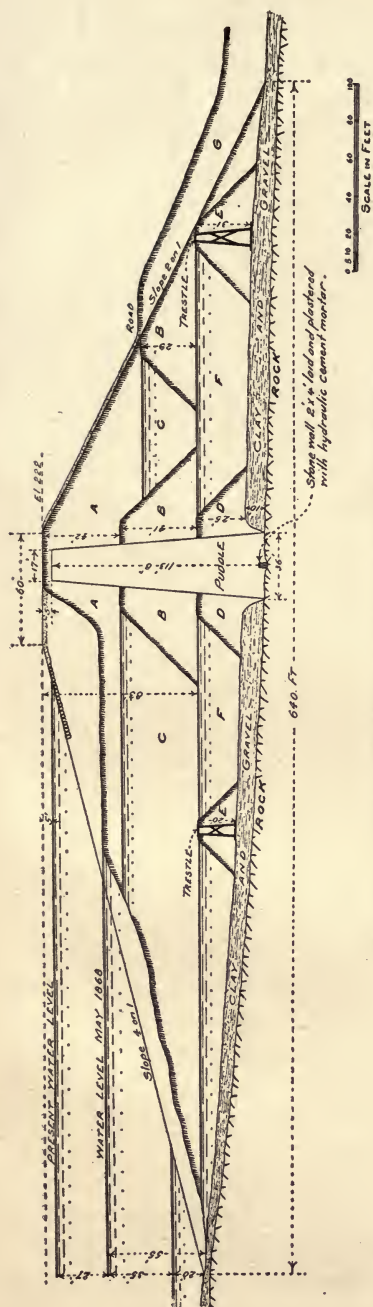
WORKING CROSS-SECTION OF DRUID LAKE DAM.
